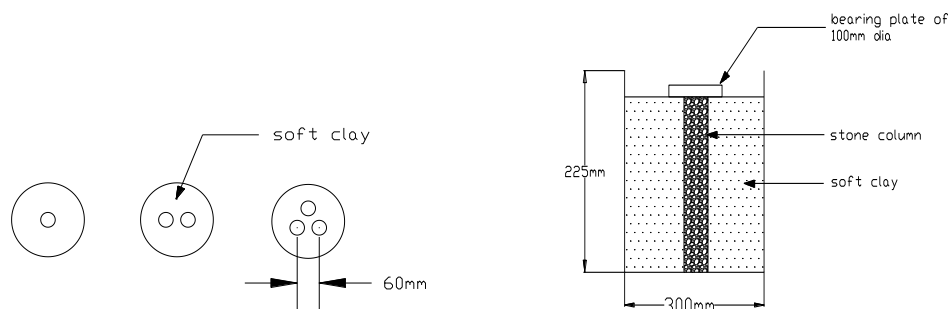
(a) Arrangement of Stone columns (b). Load test Arrangement.
